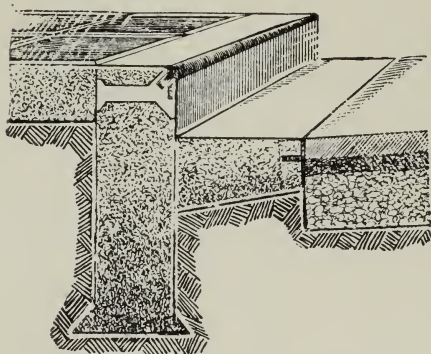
Concrete Sidewalk Curb, with Steel Corner-Bar.
